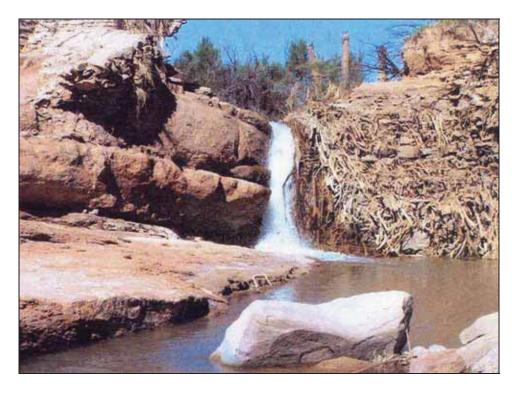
View of the diversion dam after the initial 2005 breach, facing west. Note wooden pilings visible over the top left.
